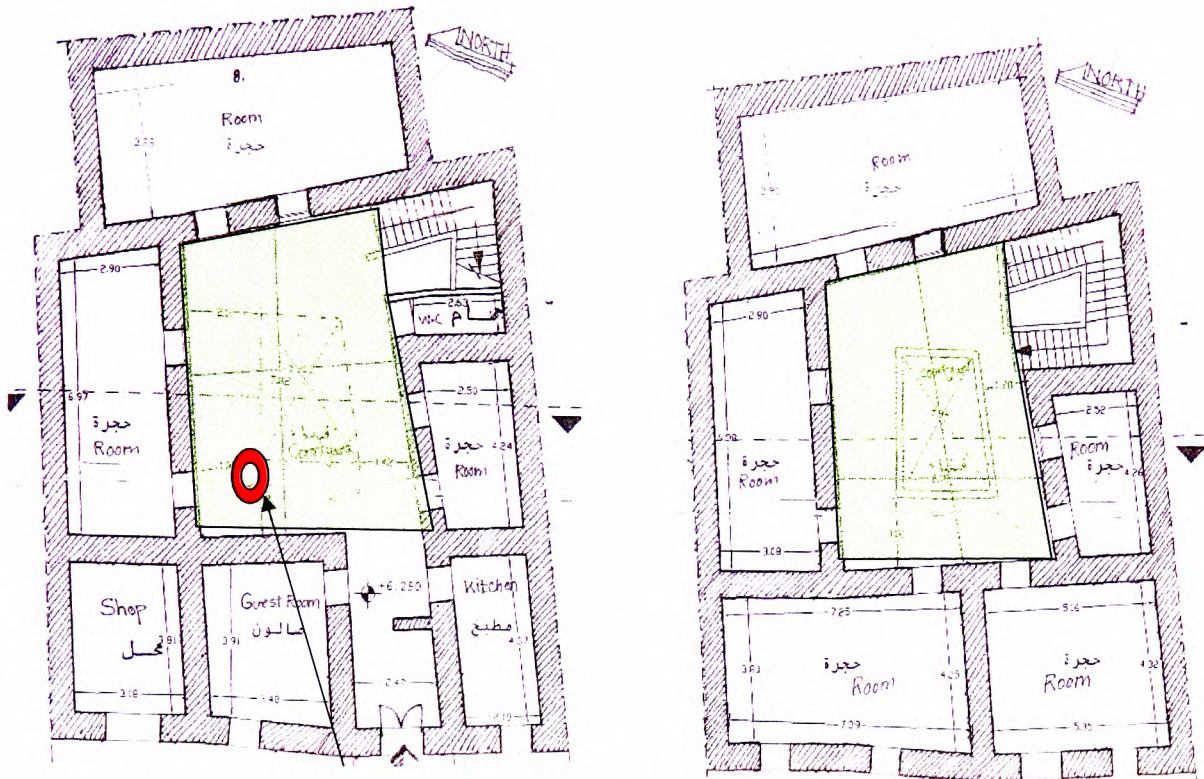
40: Ground and second floor plan showing the position of the instrument.
